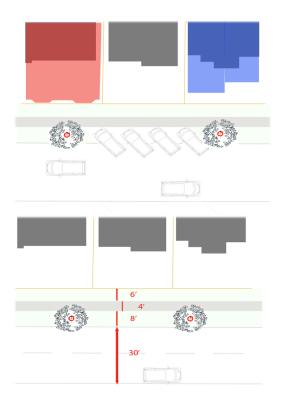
(a) plan view of showing dimensions of the road right-of-way in East Vancouver and (b) showing the expansive road pavement width to accommodate angled parking According to City of Vancouver's parking bylaw, the minimum size for small car bays is 4.6m (15') in length and 2.3m (7.5') in width. Assuming that one parking spot is required for each proposed infill development unit (typically one lot would produce three full size dwelling units), the area of surface parking required is 22.5' by 15', which occupies than 10% of the site area and well within the rear set back line of the property.
